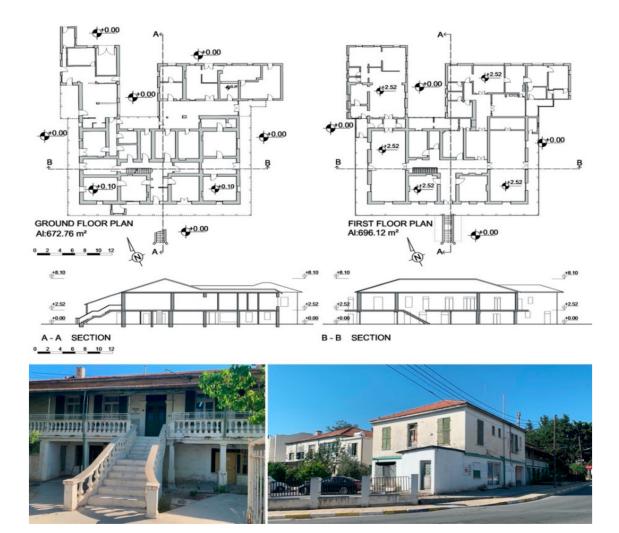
Plans, sections, and photos of the building (photos by Beser Oktay Vehbi).
